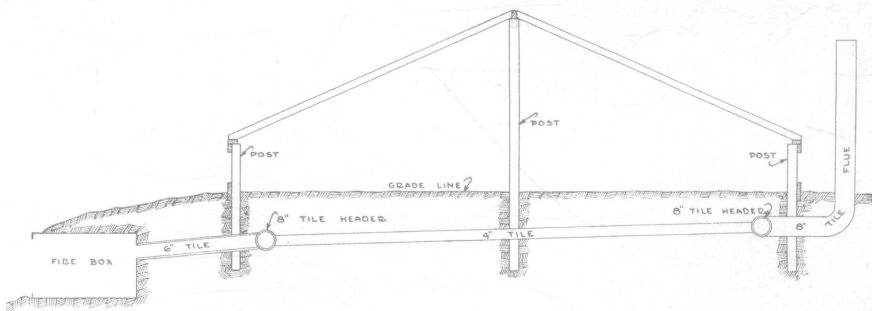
Diagram showing method of laying tile for a flue-heated, muslin-covered plant house. Height of ridge pole is 6 feet, side walls are 2 feet high, and width of structure is 22 feet.
